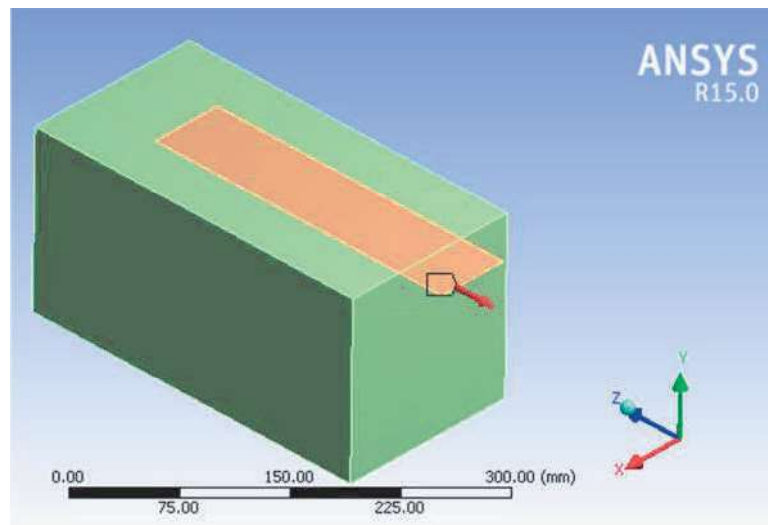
Loading Condition of Concrete Specimen with Bonded GFRP (200 mm)
